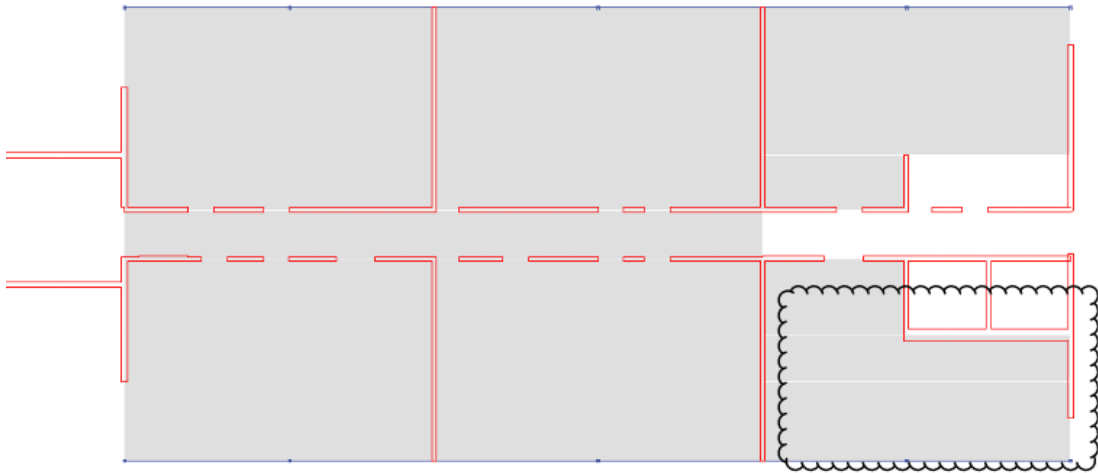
, Expected Localized Damage around Corner Walls in the North building
